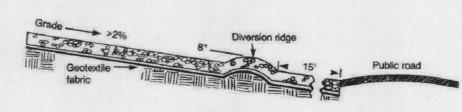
Cross-section of a Construction Entrance/Exit (NC, 1993)
